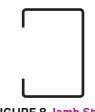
Jamb Stud 92x65 x 1.5mm BMT Plan
